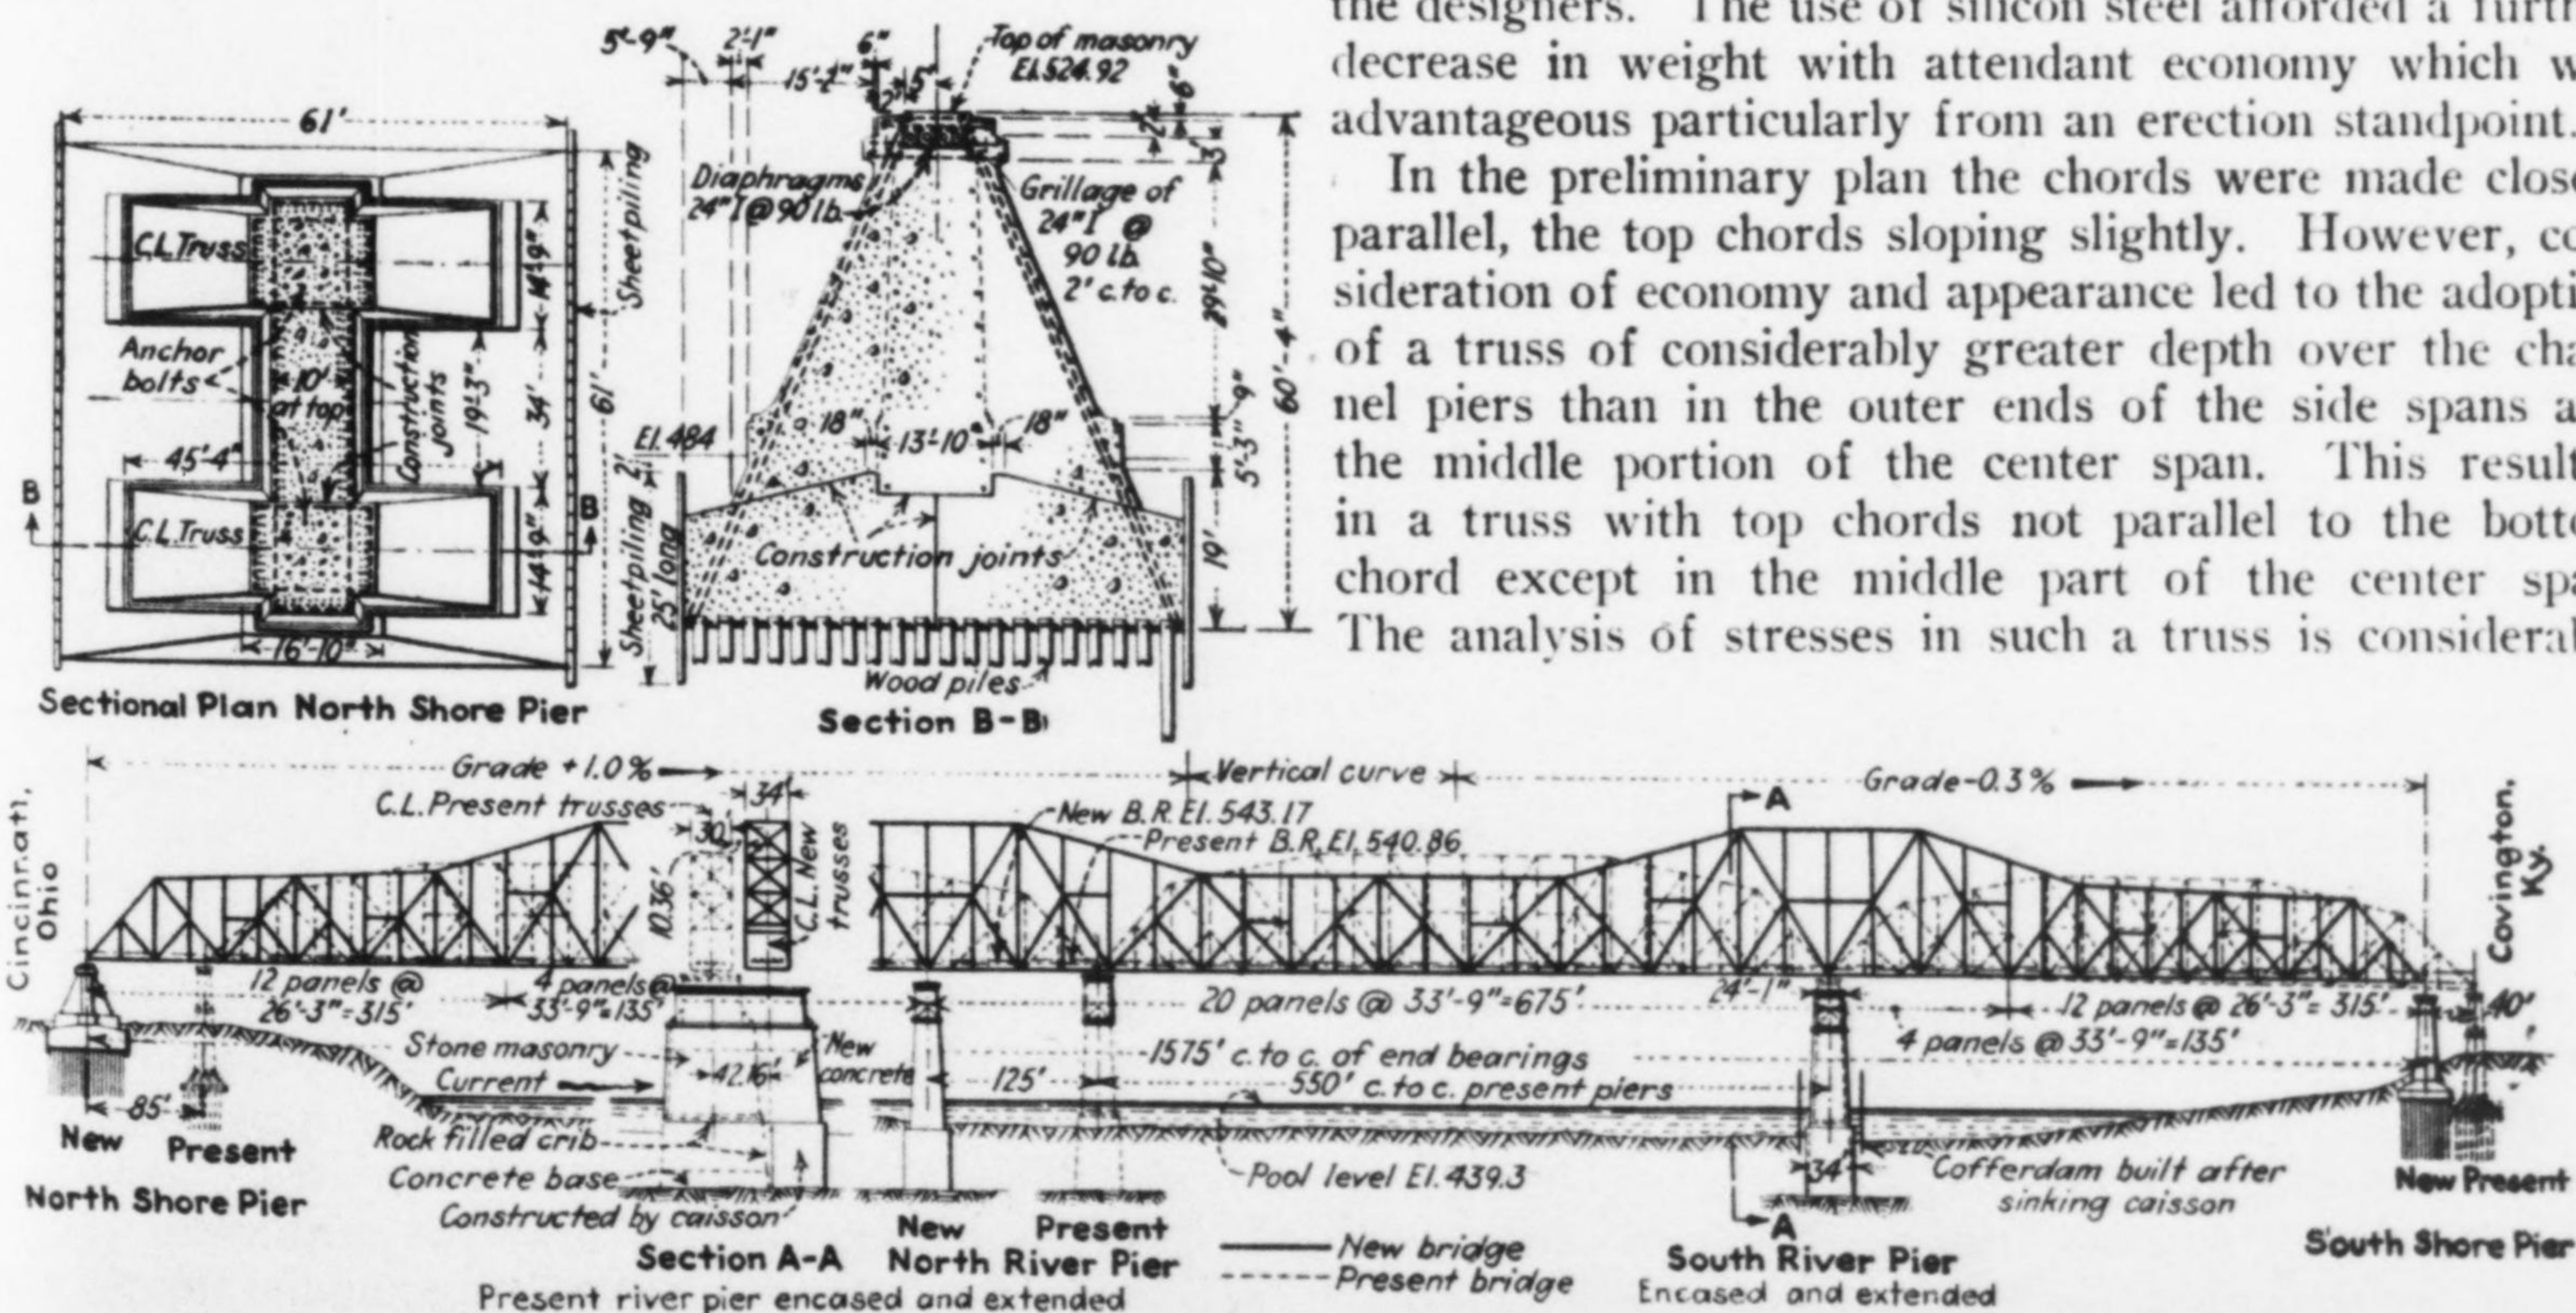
ELEVATION OF 1,575-FT. CONTINUOUS TRUSS AND FOUNDATION DETAILS
